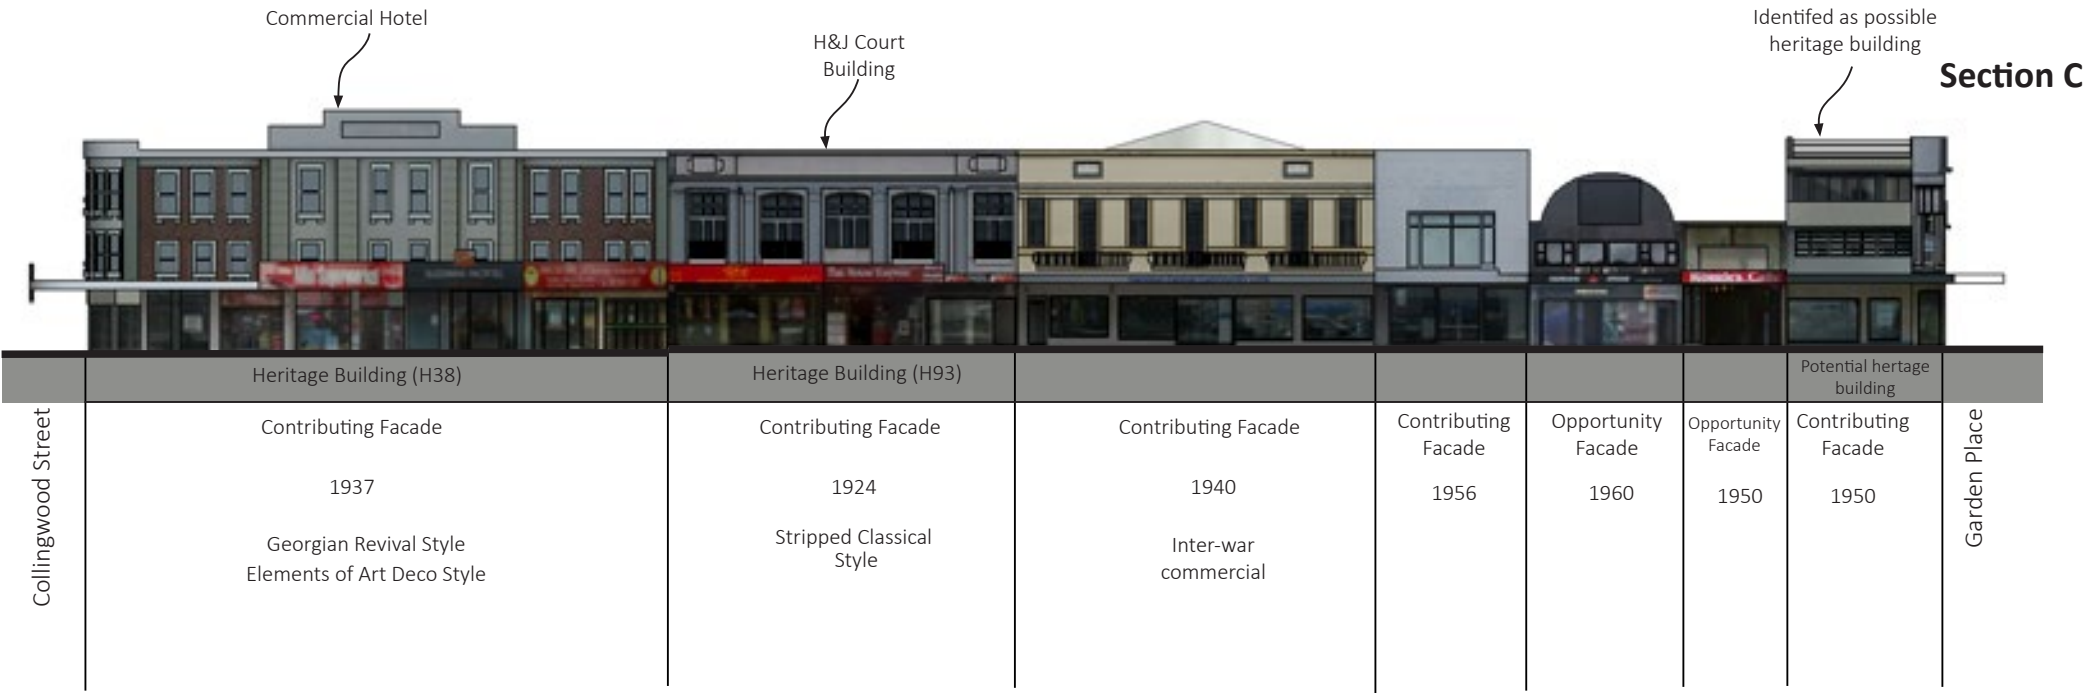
Western Street Elevation - Collingwood Street to Garden Place
